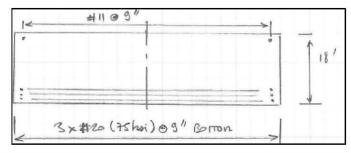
Foundation Cap 1NT and 1ST, Insufficient Reinforcement Development at Section 2
